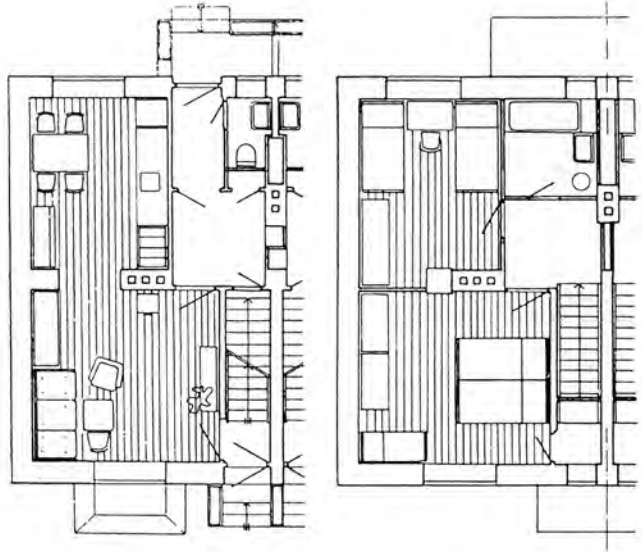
T51 TWO-STORY ROW HOUSE PLAN, 1950.
